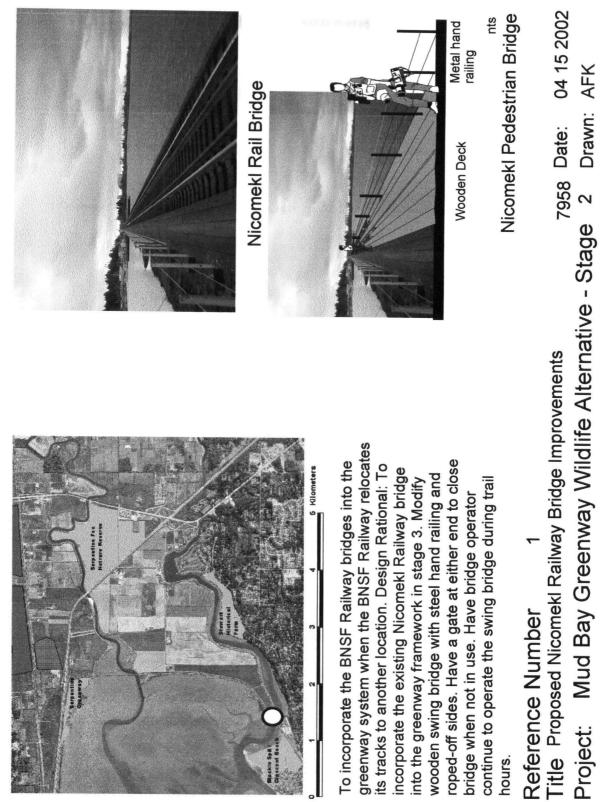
Proposed Nicomekl Railway Bridge Improvements
